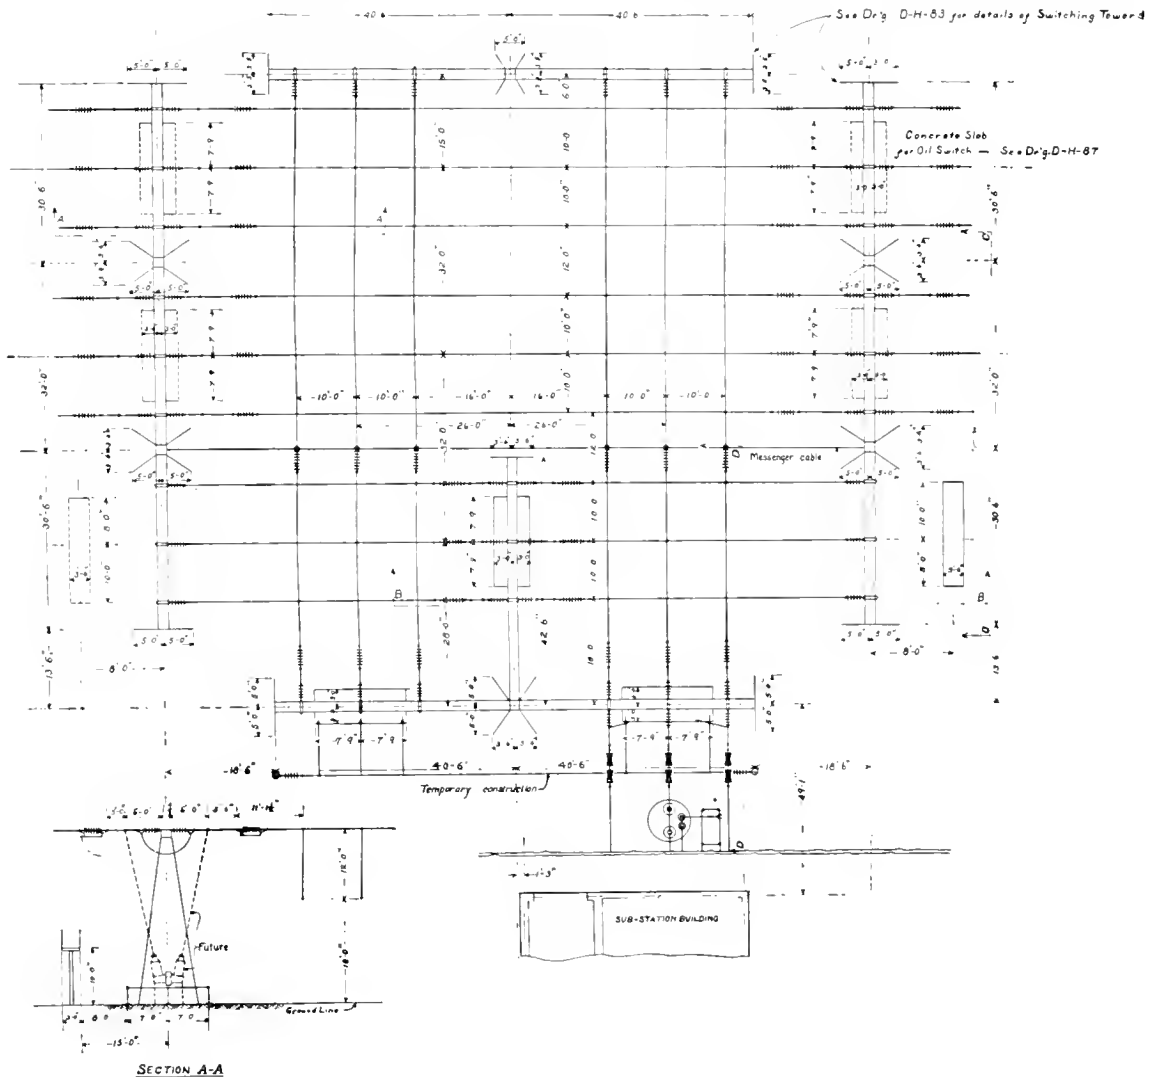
General Plan of Outdoor Switching Apparatus, Ware Substation
